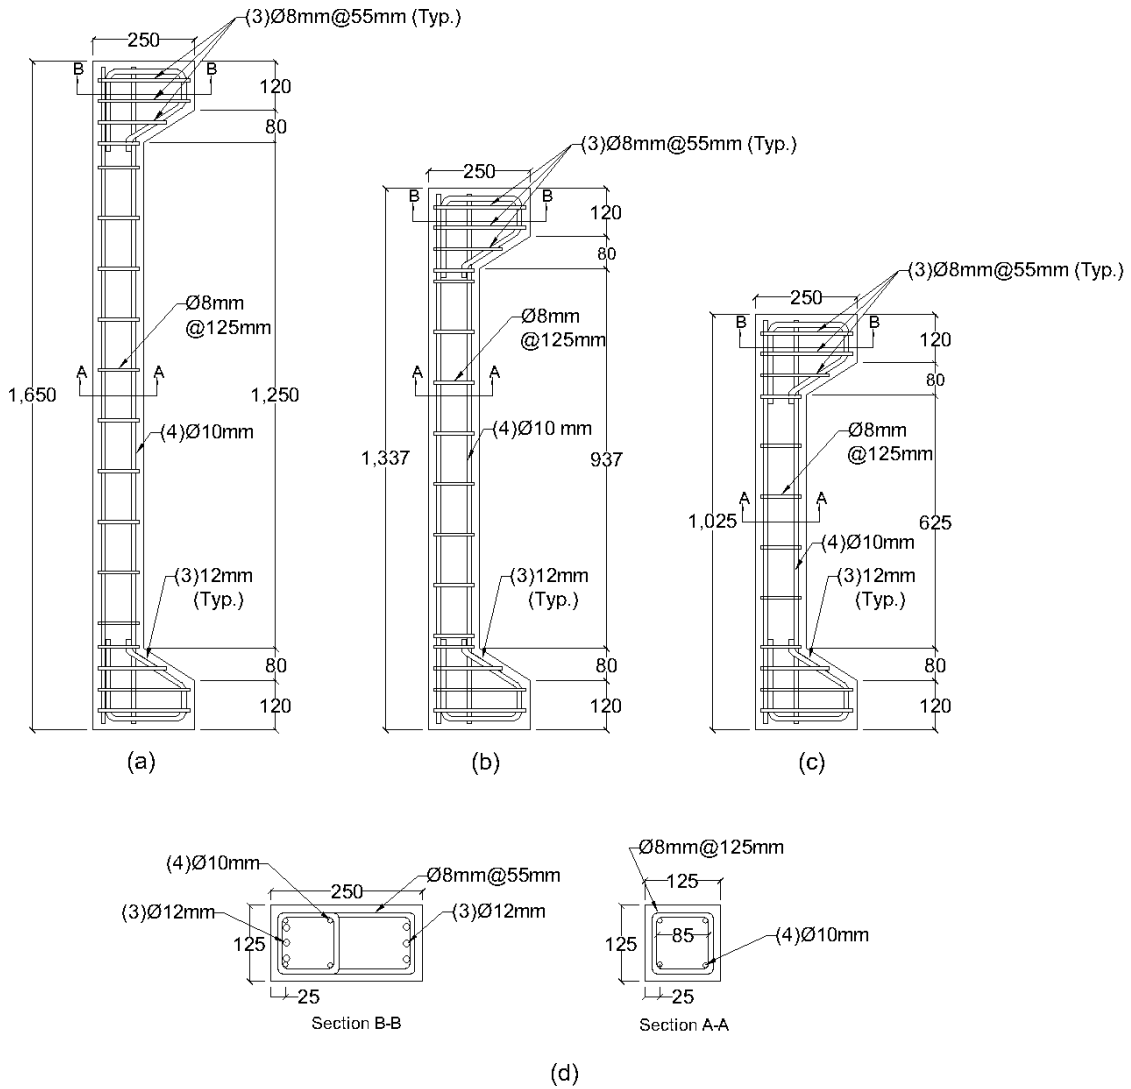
Reinforcement details (all dimensions are in mm): (a) Slender column of $kl/r=34.5$. (b) Slender column of $kl/r=26$ (c) short column of $kl/r=17.24$ (d) cross-sections.
